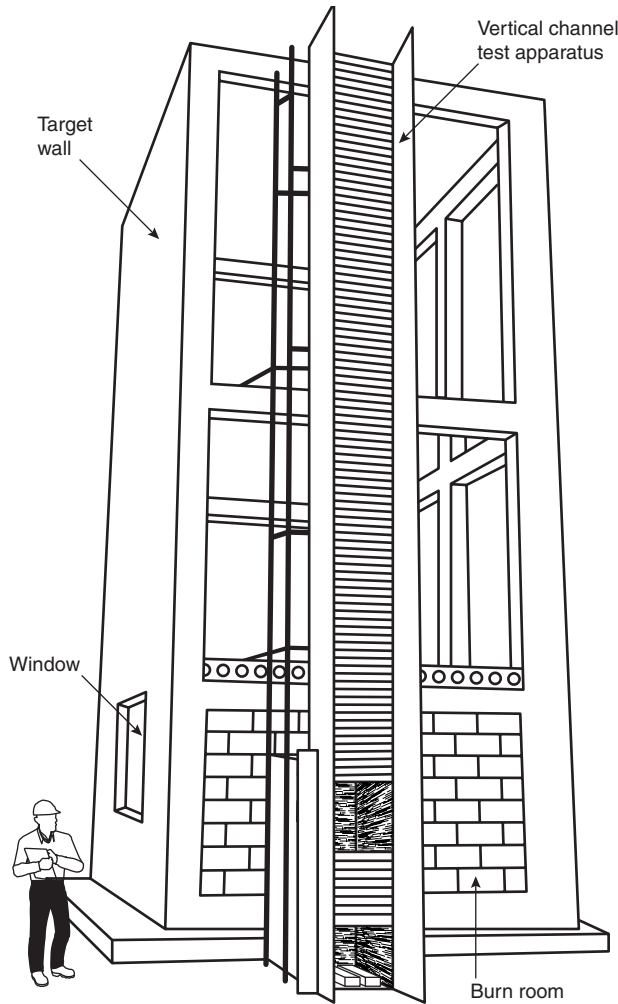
Exterior wall fire test facility used by Oleszkiewicz.⁶¹
